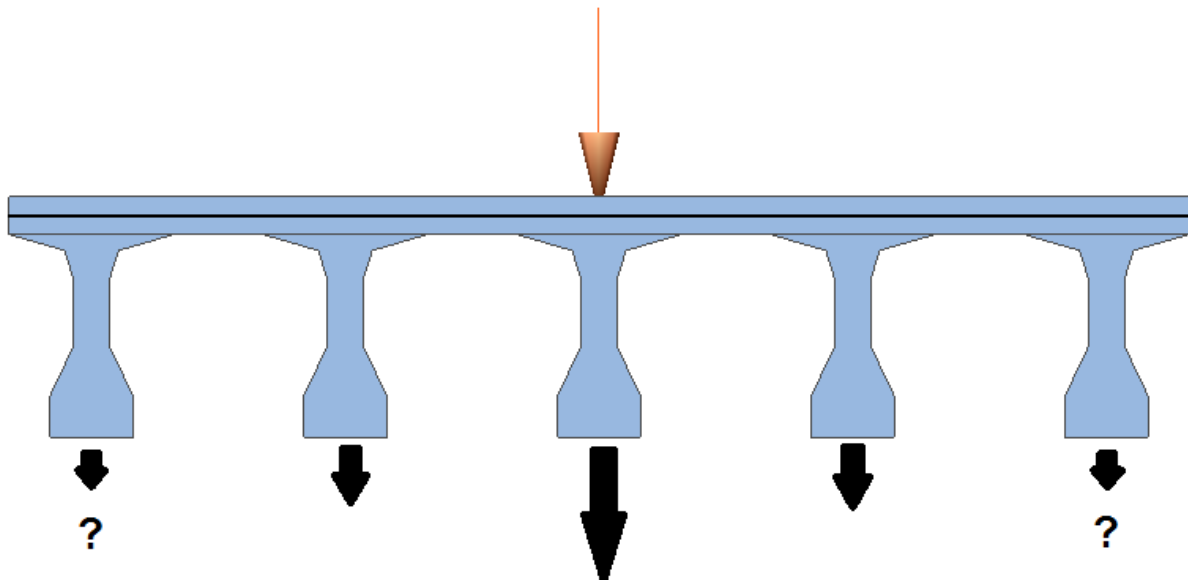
numerical model with five-girders showing the possible deflections of the outer girders
